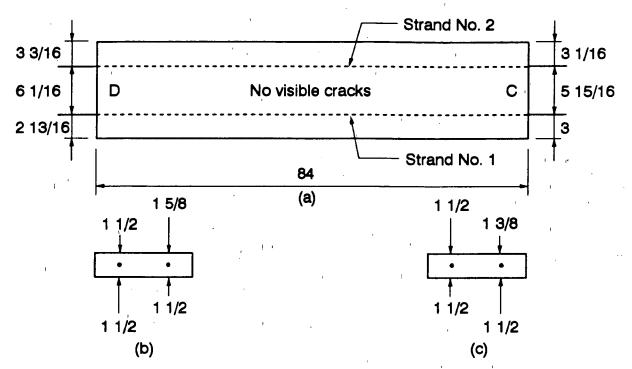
Specimen No. 4-3.0TC-7 (dimensions shown in inches):
